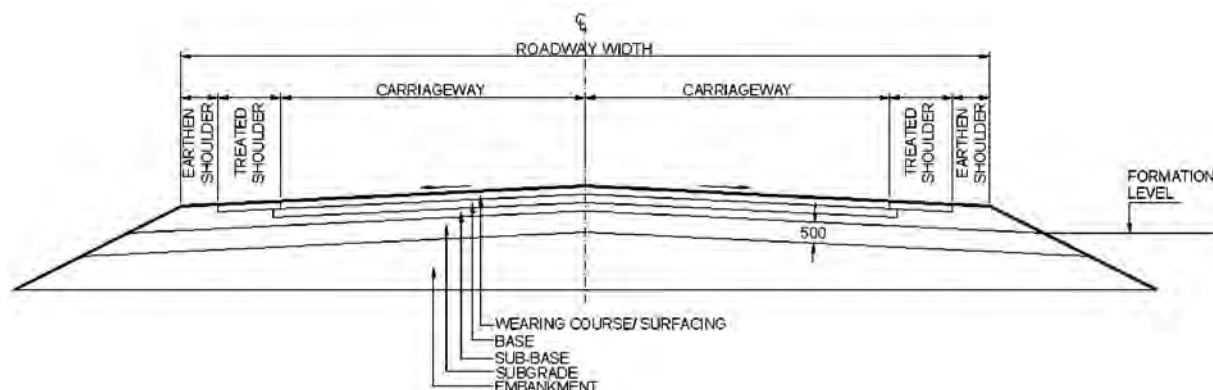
Terms Used in the Specifications to Describe Road Cross-Section Elements with a Flexible Pavement
